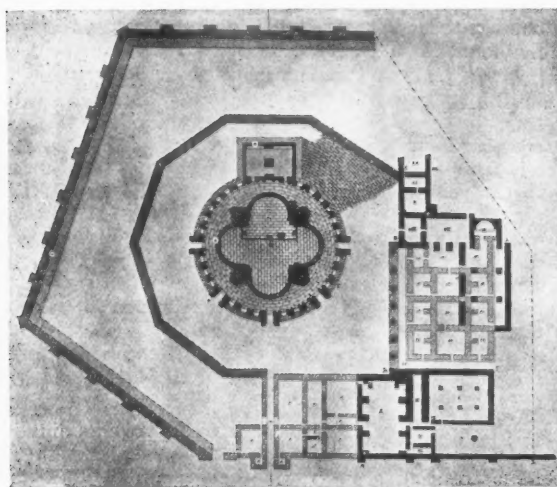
The Patriarchal church at Zwarthnotz and its surrounding buildings
